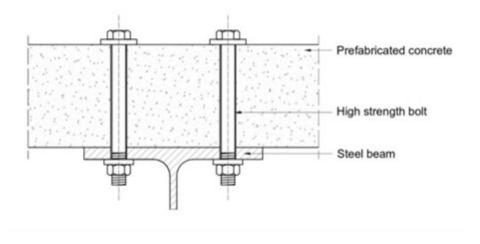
THROUGH BOLT: DETACHABLE CONNECTION FOR STEEL AND PRE-CAST CONCRETE ELEMENTS. ADAPTED FROM KOZMA, A. (2020). DEMOUNTABLE COMPOSITE BEAMS: ANALYTICAL CALCULATION APPROACHES FOR SHEAR CONNECTIONS WITH MULTILINEAR LOAD-SLIP BEHAVIOUR (DOCTORAL DISSERTATION, UNIVERSITY OF LUXEMBOURG, LUXEMBOURG). ©KOZMA
